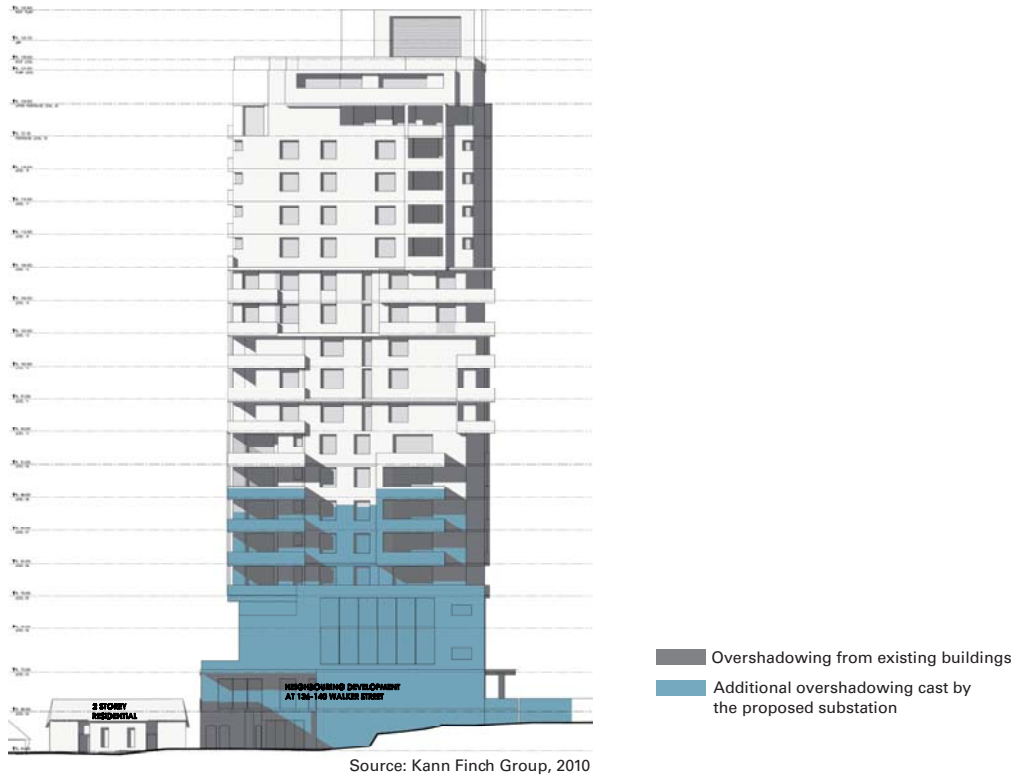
Additional Shadows Cast by Proposed Substation (June 21 14h00) - Western Elevation
